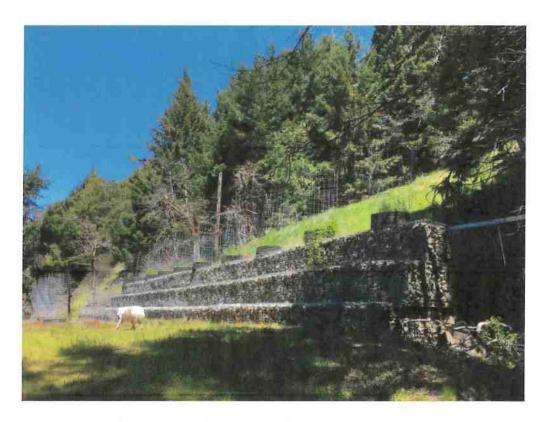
Southeast Cultivation Area (CA 1-2, GH1)
